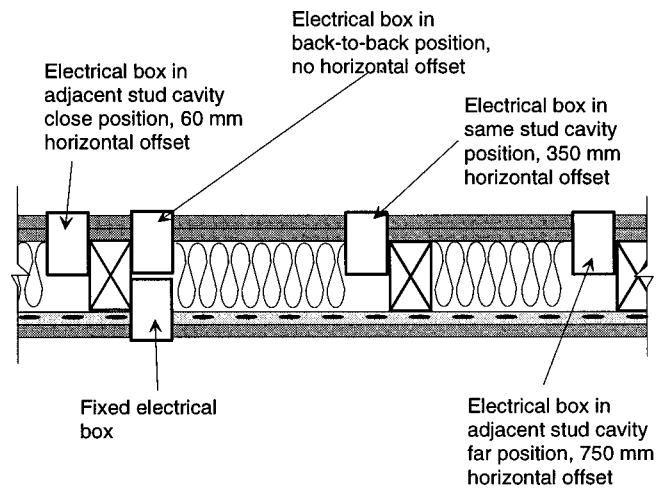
Positions of electrical boxes in the single-stud wall. The single-stud wall was constructed as follows: two layers 15.9-mm type-X gypsum board, 38×89 mm wood studs, 400 mm o.c., 90-mm glass fiber batts displaced around electrical boxes, 13-mm resilient metal channel spaced 600 mm o.c., single layer 15.9 mm type-X gypsum board.
